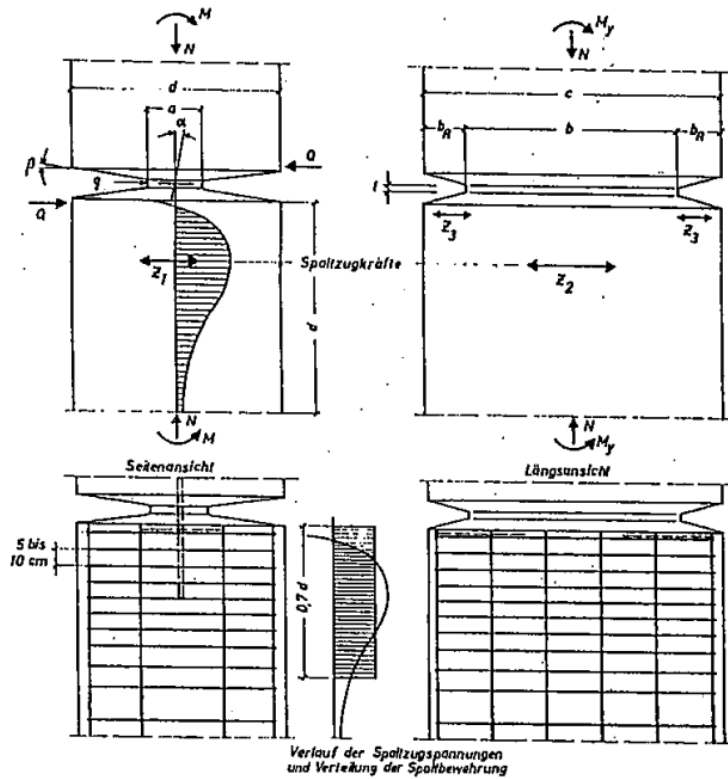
Bursting stress at concrete hinges. Leonhardt (6)
